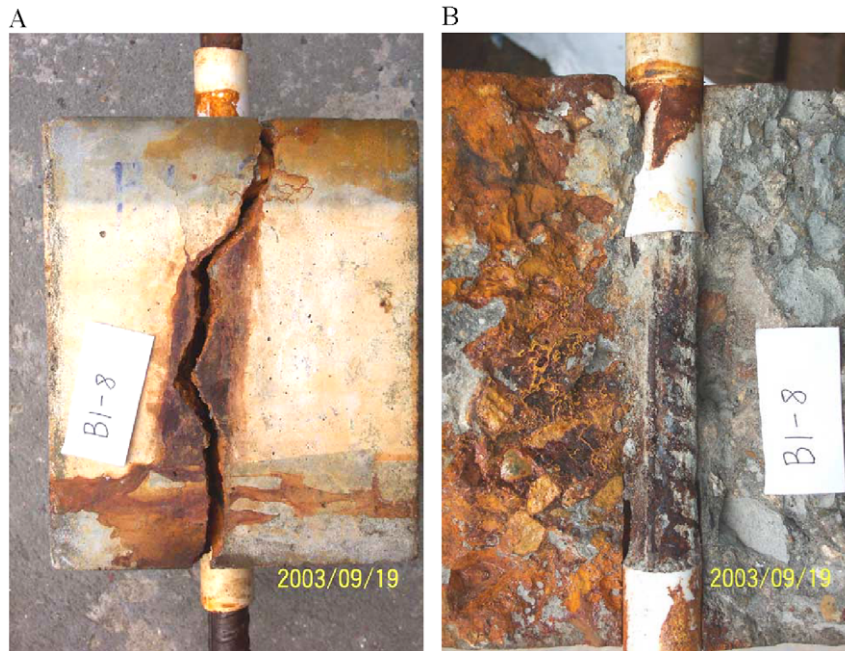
Splitting of corroded D2 specimen: (A) wide crack after cyclic test; (B) after breaking of the specimen.
